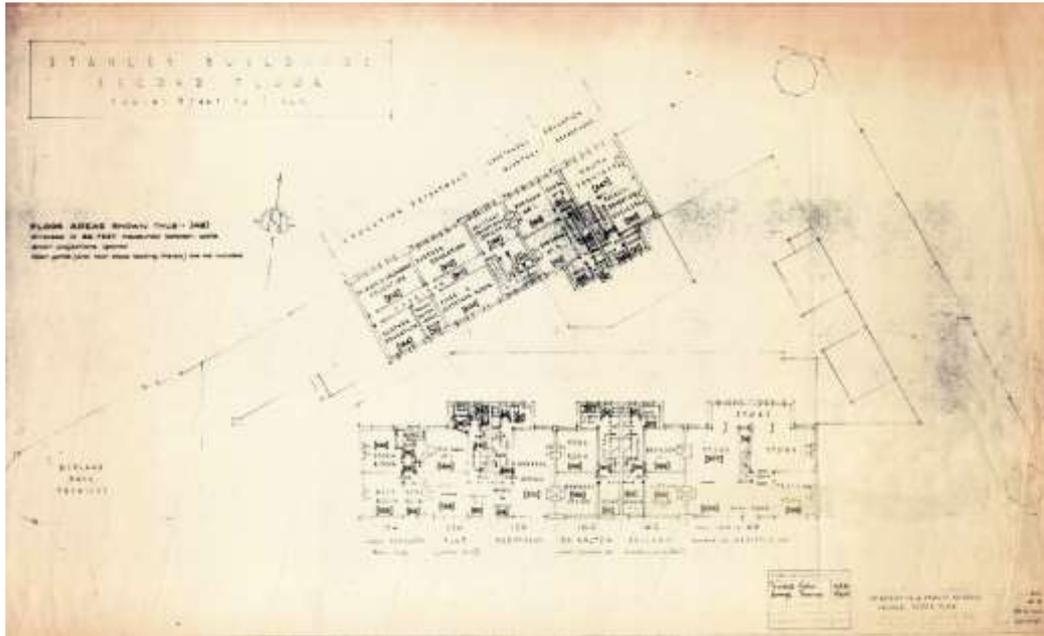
Original Floor Plans of the Building (source: Blackpool Council)
